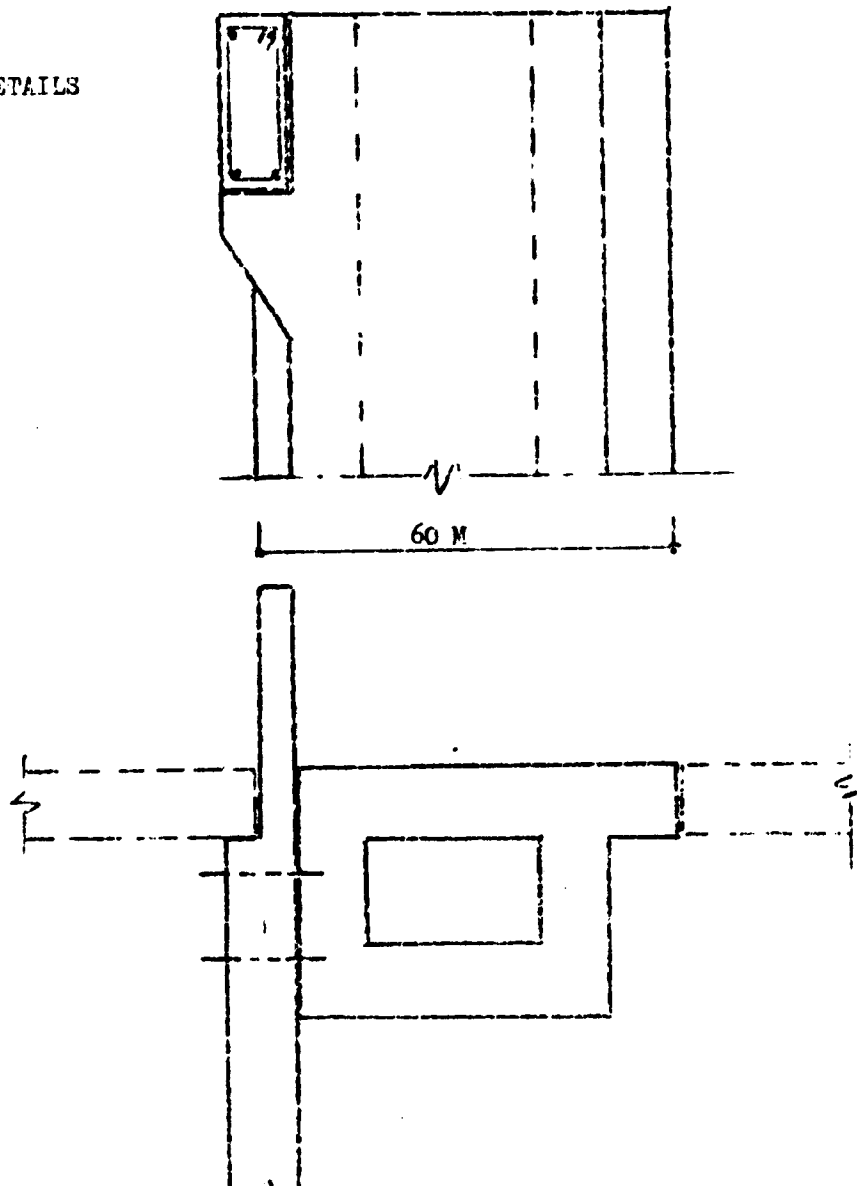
CROSS BEAM FOR ROOF SUPPORT
